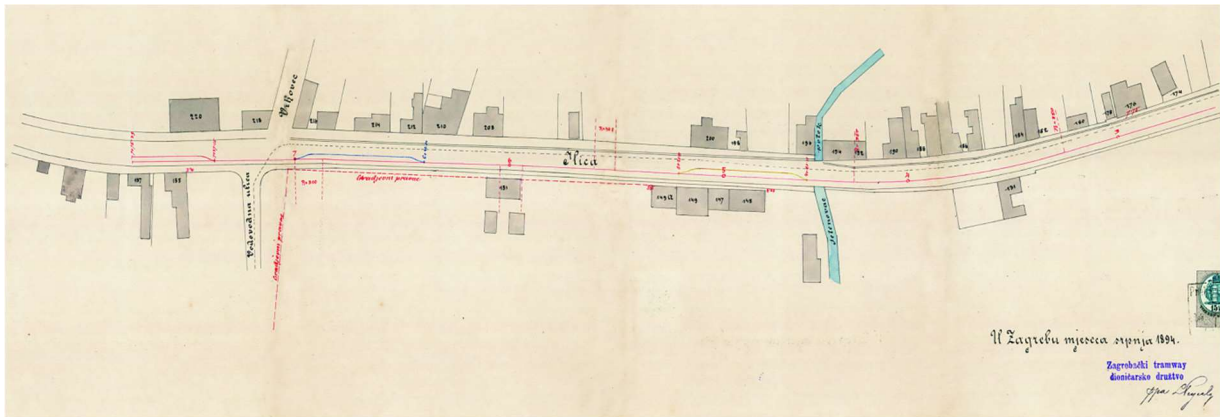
The Layout Plan of the Tram Line in Ilica from Kolodvorska Street to Vodovodna Street, 1894.
